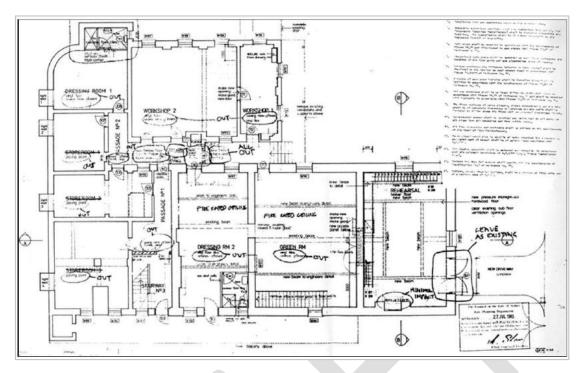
Amended basement plan, approved in 1983, showing the proposed amendments or "omissions". (Source: City of Sydney Archives 539/1/82)
